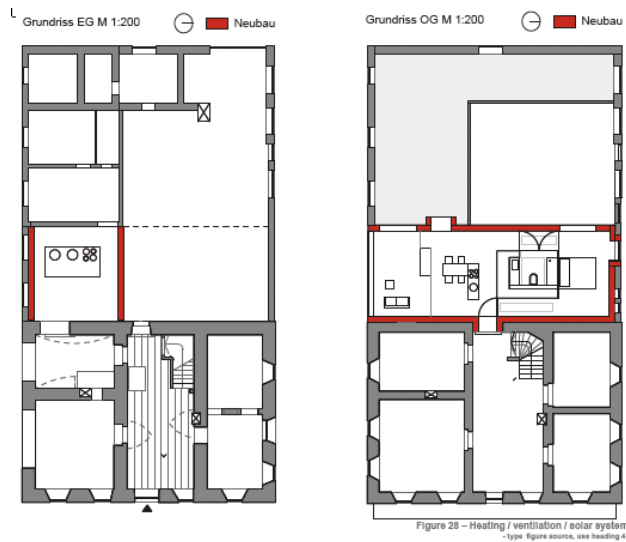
AlpHouse pilot-building E. in Schleching, design alternative, by Sarah Hartmann for TUM Landraum
